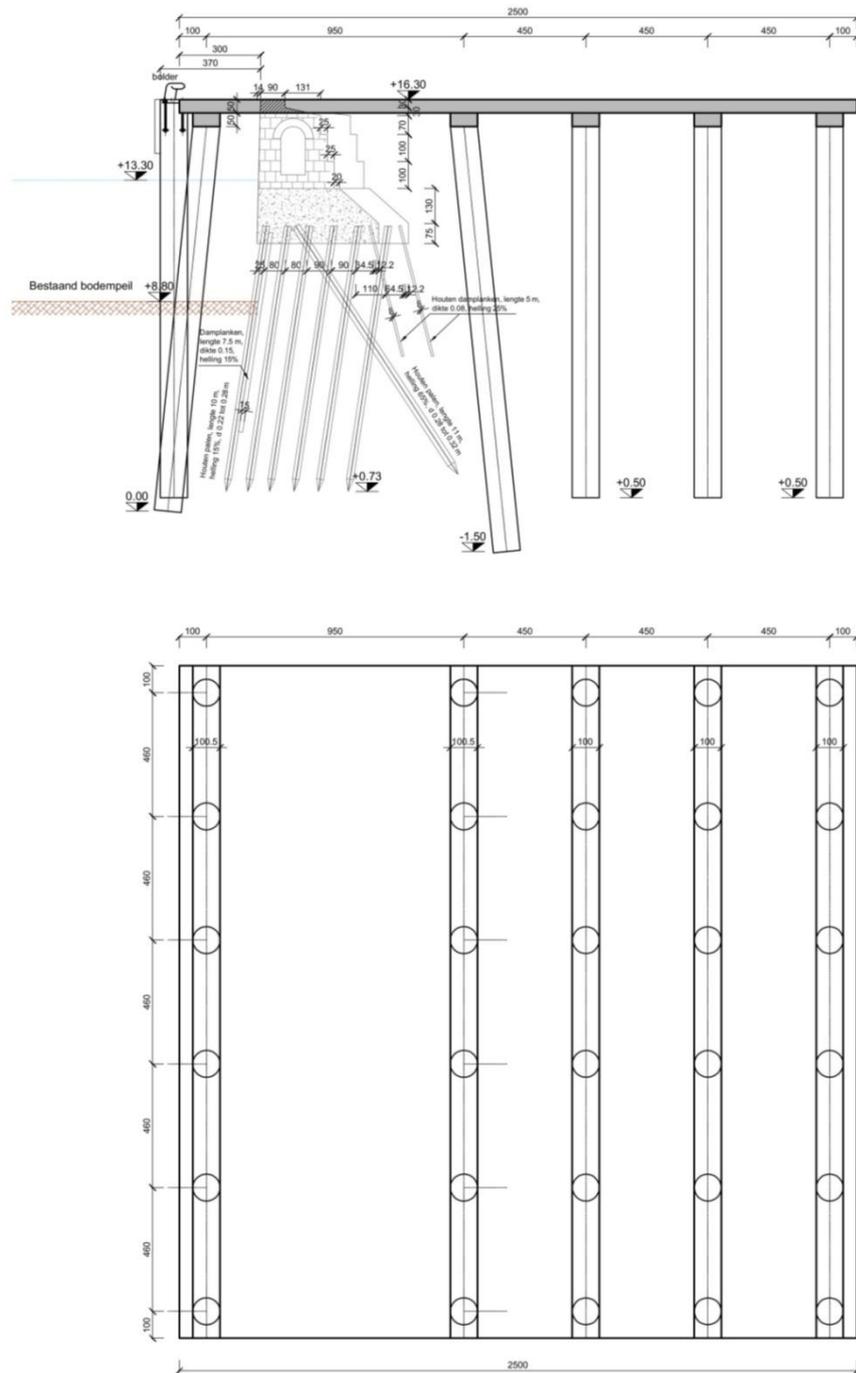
Vergote Dock – reinforced quay wall – loading/unloading area – 60 kN/m² mobile load (source: Technum)
